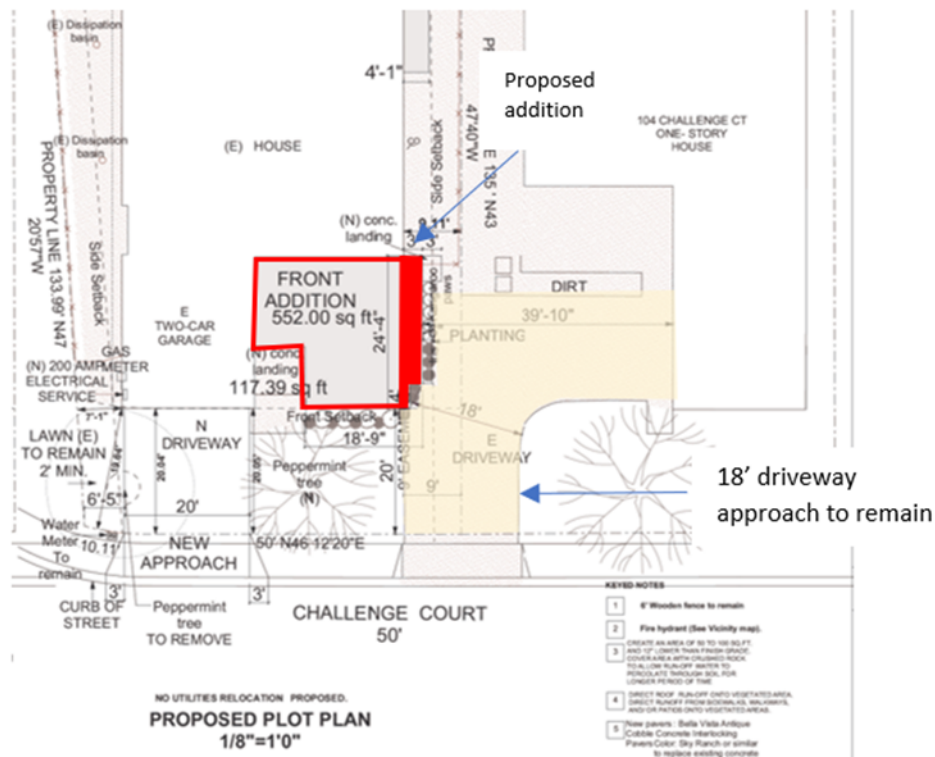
Proposed Site Plan showing 18' driveway approach and proposed front addition
